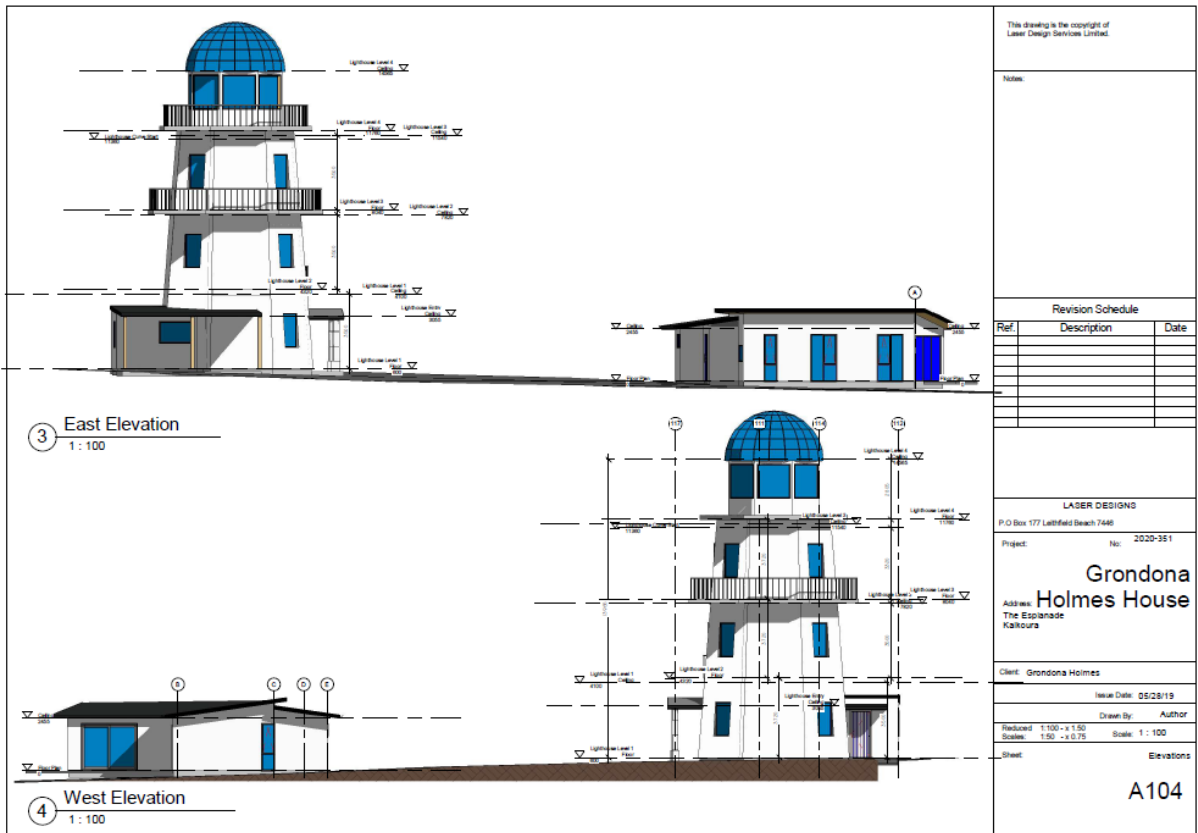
Preliminary design of the two buildings (no foundations detail shown).
